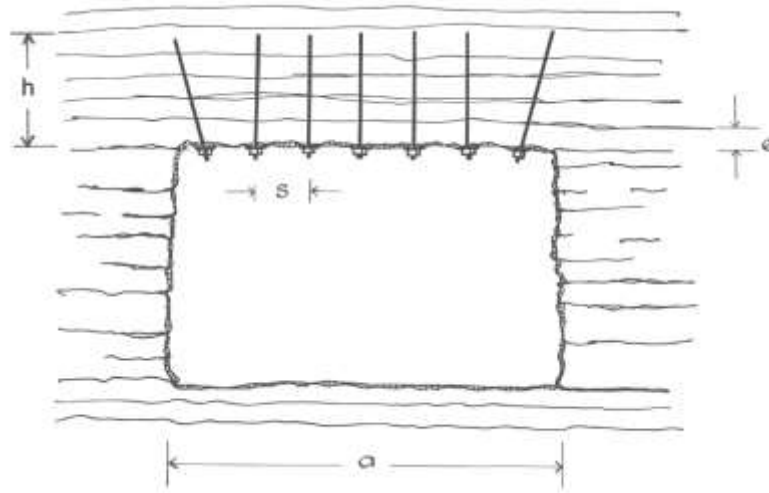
Example of tunnel section reinforcement using rock bolts (*Almenara et al.*, 2024).
